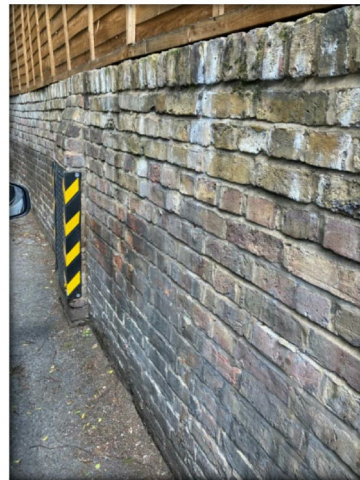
Photograph Of Damage Expressed To Eastern Flank Wall, Adjacent to T02 – Common Lime.
